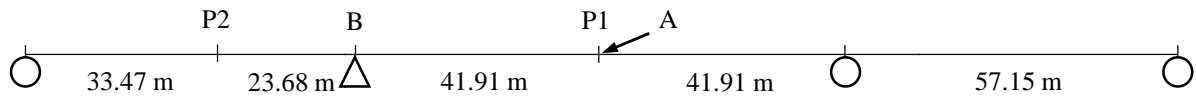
Schematic of bridge span, fire locations, and locations of maximum deflection.
